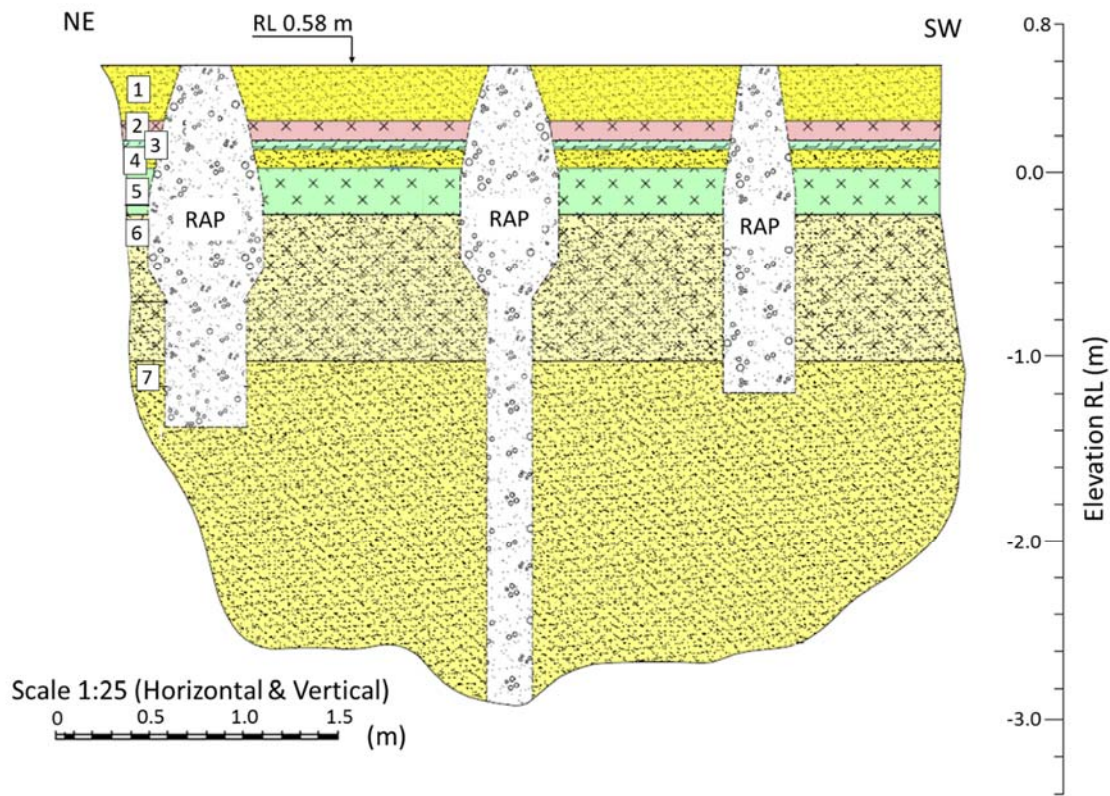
Cross-section of excavation trench at the 6-RAP-1 Test Panel. Modified from van Ballegooy et al. 2017.
